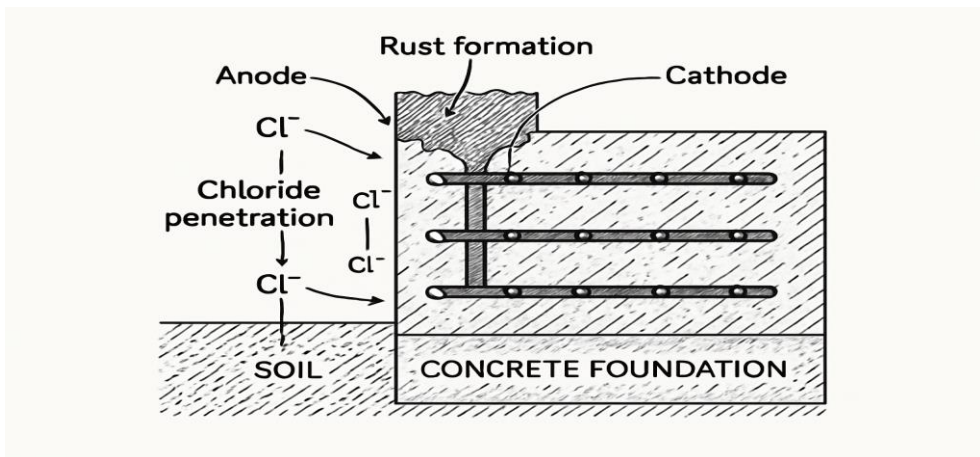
Schematic representation of reinforcement steel corrosion in concrete foundations, showing chloride penetration from soil and the electrochemical corrosion process
